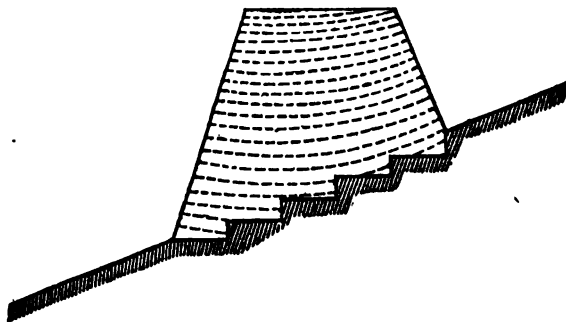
is the section of an embankment showing how its base should be stepped into the slope on sidelong ground.
